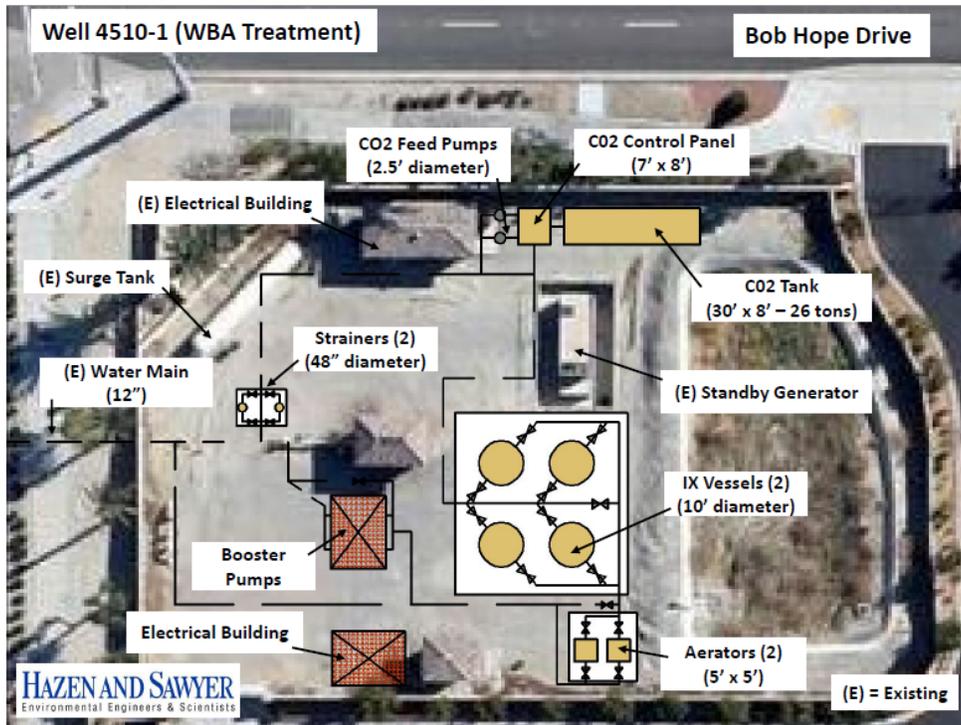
Site Layout for a RCF Facility at 4510-1
